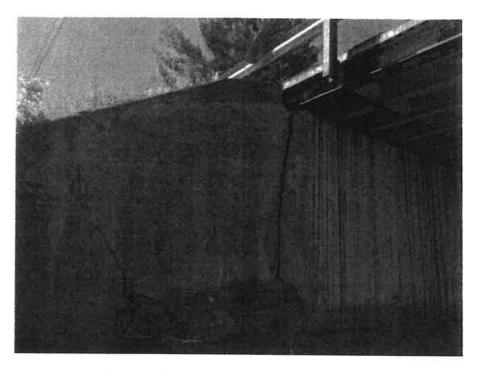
Northwest Corner/West Abutment Large Vertical Crack and Tilted Wingwall
